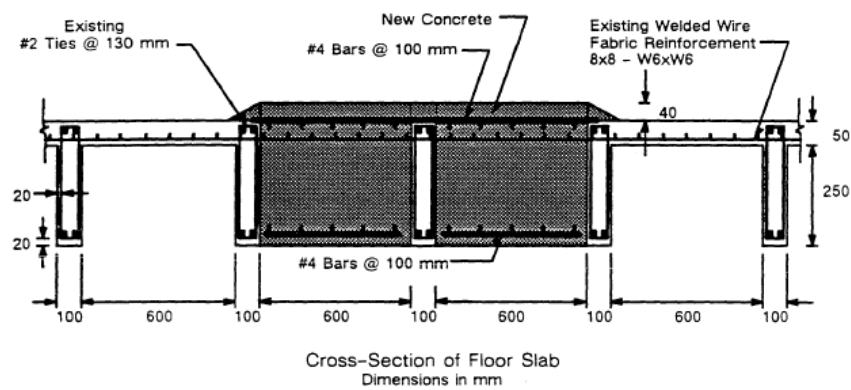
Detail of typical slab reinforcement at locations of steel frame attachment to Frames 1 and 5 (Downs, et al., 1991)
